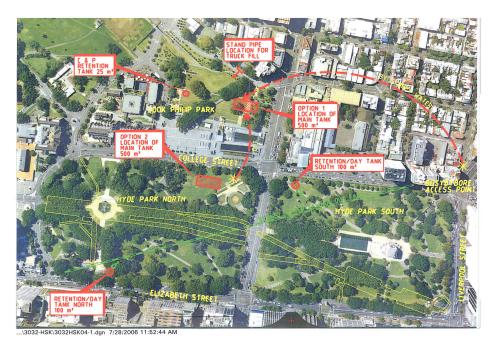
Aerial Plan - Location of Proposed Storage Tanks and Day Tanks
